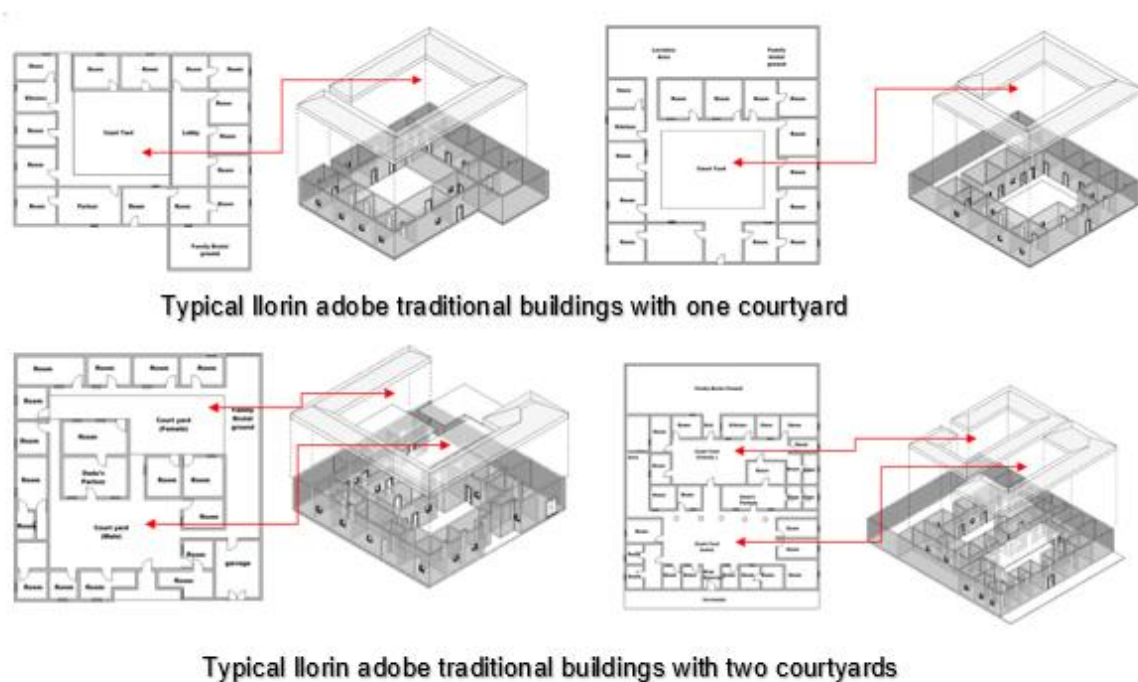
Typical Ilorin adobe traditional building plans showing positions of courtyards.
